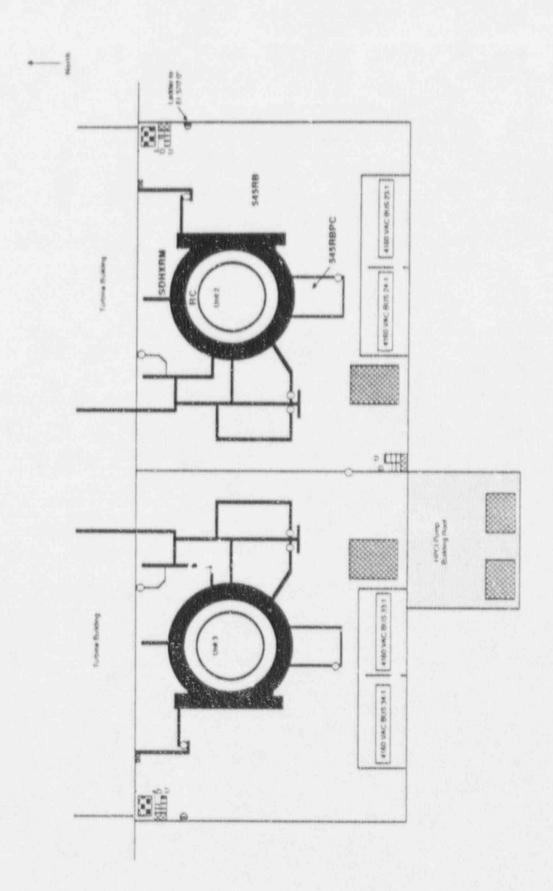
Dresden Units 2 and 3 Reactor Buildings, Elevation 545'-6"
